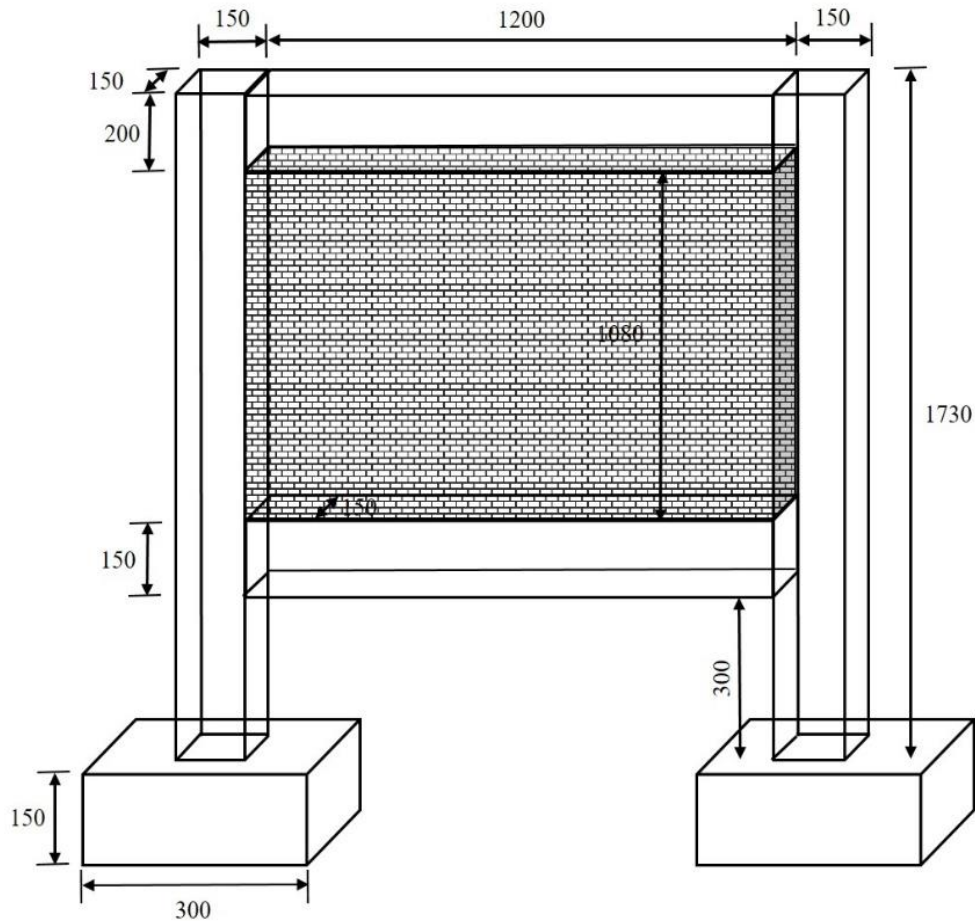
36: 2D frame with brick masonry infill (all dimensions are in mm)
